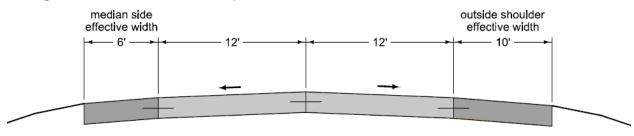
Four lane rural roadway with full width paved shoulder on the outside.
